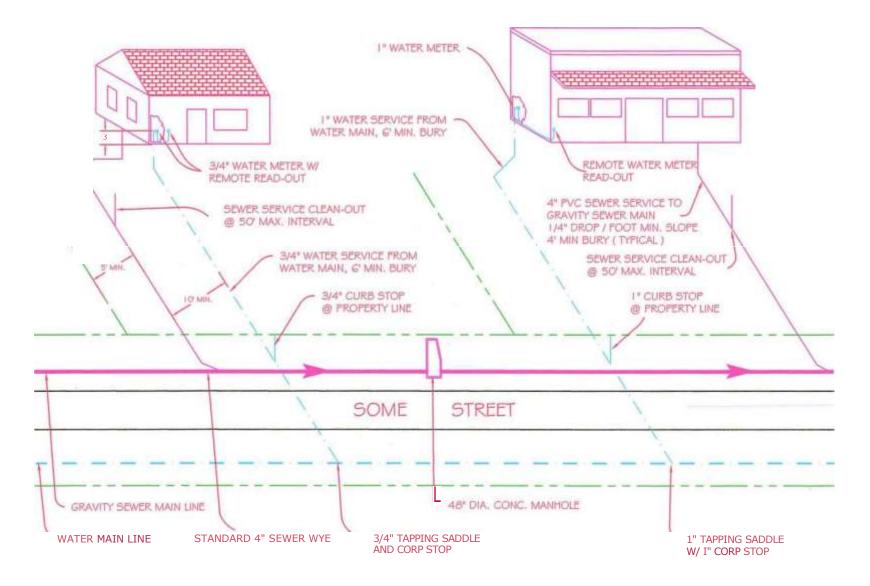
ALTERNATIVE SERVICE CONNECTION DETAIL
